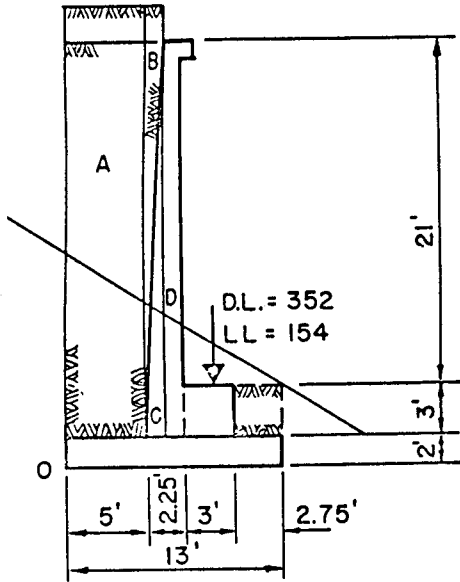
Abutment cross section showing dimensions and loads; Design Example of Figure 7-30.
